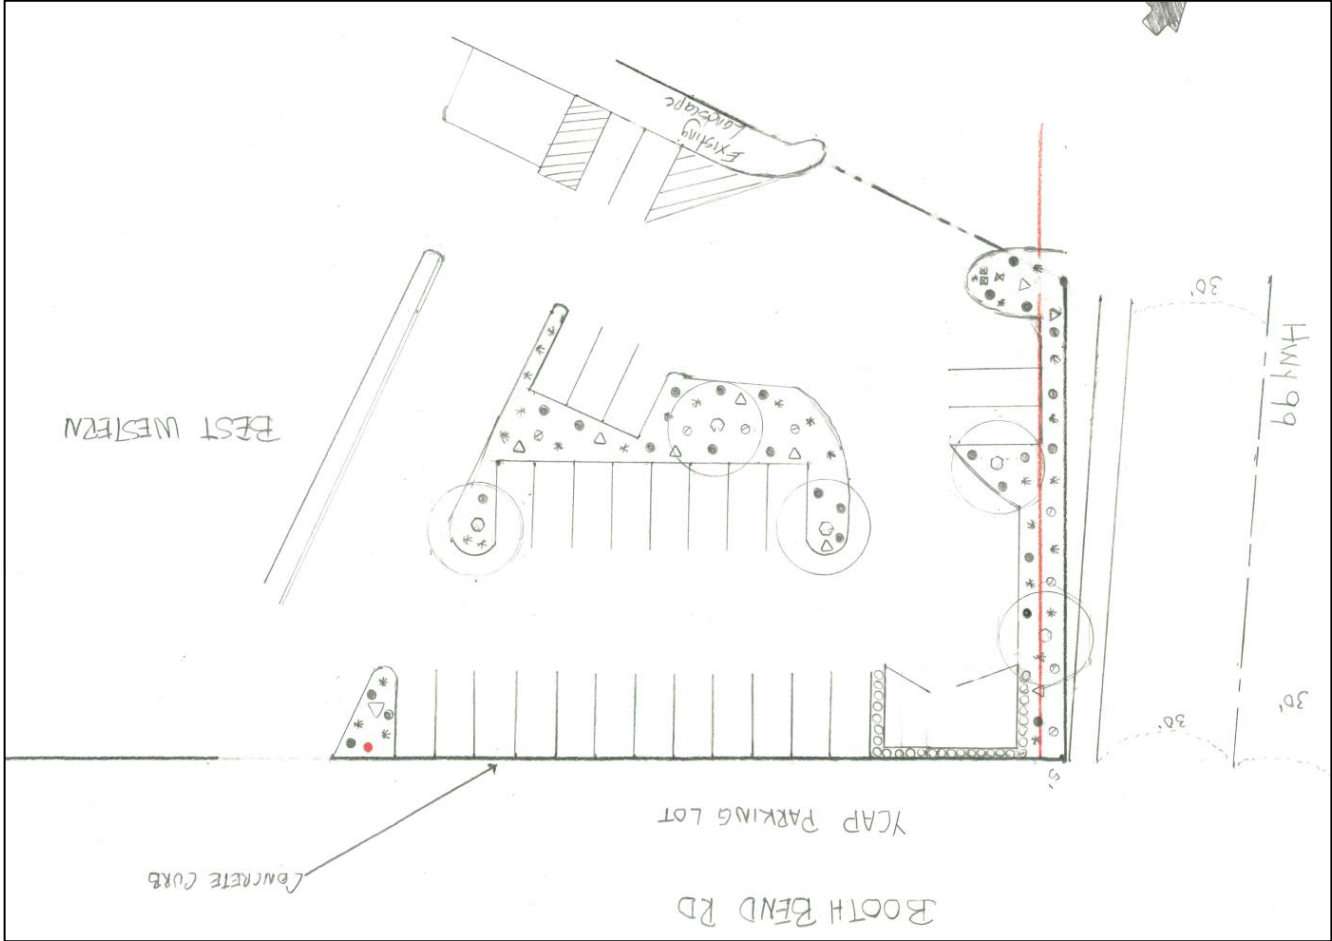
Applicant's Updated Landscape Plan, Plant List, Notes, and Details
